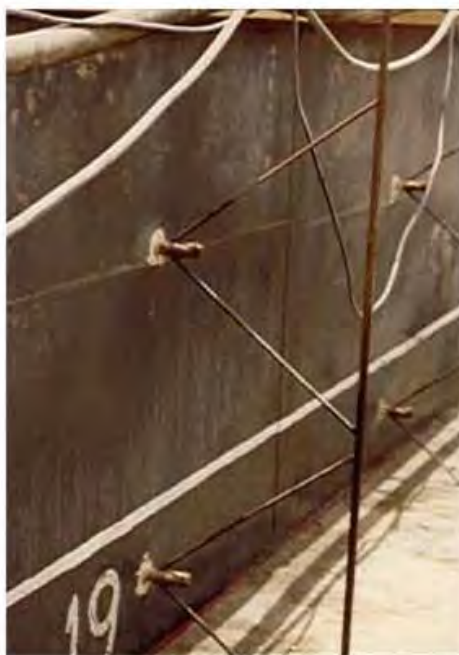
Anchoring the precast panel at site at Capanda Dam.
